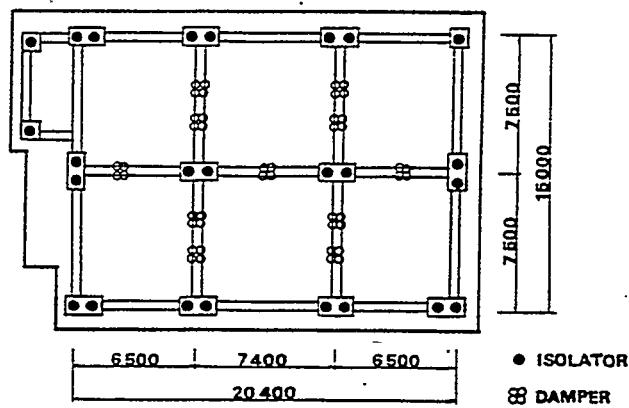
Plan of Base-Isolated Building Showing Layout of Isolators and Dampers
